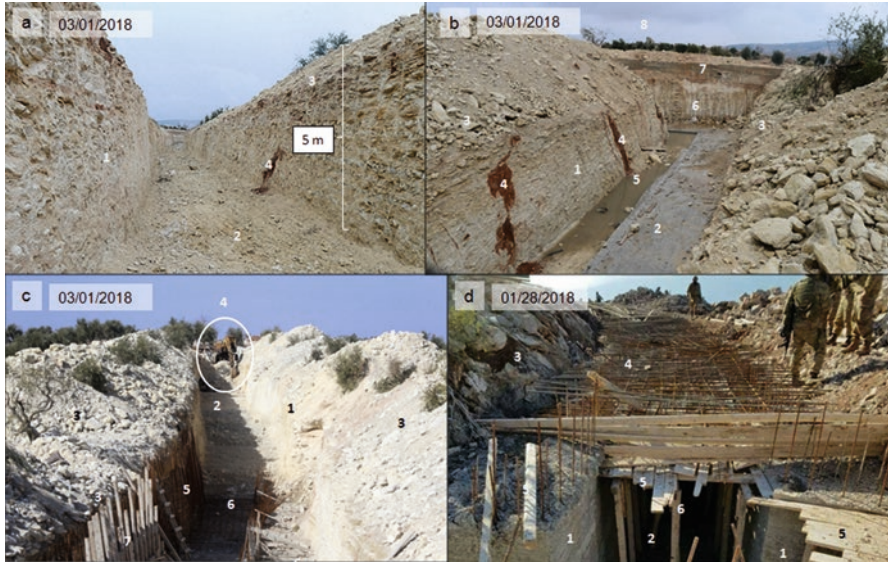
(a) View in a trench dug by / Syrian Kurds at Mt. Sakarkaya 1 March, 2018. 1 shows the near-vertical trench wall in white limestone with marls reported to be 5 m deep, 2 the trench floor, 3 spoil, and 4 seepage. The dig appears to be fresh with only minimal water seepage and no ponding. (b) View of excavated Syrian Kurdish trench at Mt. Sakarkaya (Sarkaya) 1 March 2018 (Turkish News 2018). This was dug using a mechanical excavator in white limestone with marls evidenced by striation marks (6). 1 shows the near-vertical wall with evidence of seepage (4) and ponding (5). 2 concrete floor showing where the walls were to be poured. 7 shows a concrete wall with firing point from a previous trench that has been deepened. An observation post (8) can be seen on the horizon. c View of excavated Syrian Kurdish trench at Sakarkaya (Sarkaya) Hill 1 March 2018 (Murat Kula—Anadolu Agency). 1. Trench walls and floor (2) in white chalky limestone with spoil (3) on the edges. The white oval at 4 shows a tracked excavator in digging position with a two-part hinged arm. The bucket appears to be small (305 mm). 5 Rebar on the walls and floor partially wired into a grid. 6 Form boards ready for concrete pour. d CCHT on Mt. Bursaya (Sozcu News Agency 2018). 1 Concrete wall to the trench, 2 concrete floor, 3 made slope with rocks embedded in concrete, 4 rebar grid on the roof over form boards (5) and shoring (6) ready for the concrete pour
